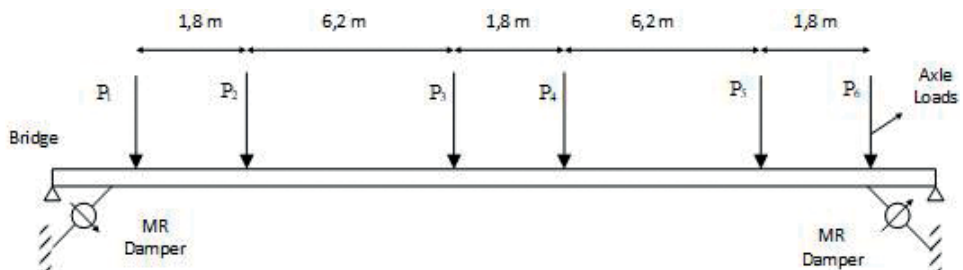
Railway bridge with MR dampers acted on moving axle loads.
